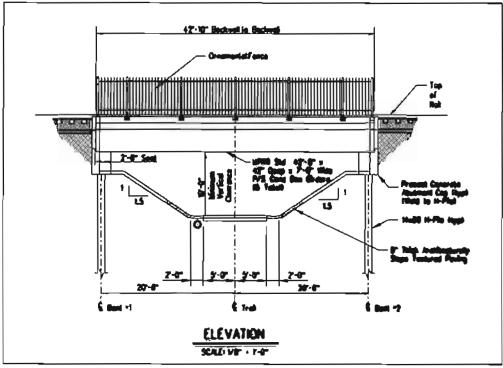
UPRR Precast Concrete Box Girder Underpass Elevation View (Typical)
